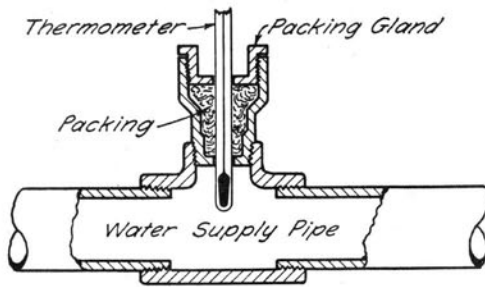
METHOD OF INSERTING THERMOMETERS INTO PIPES
